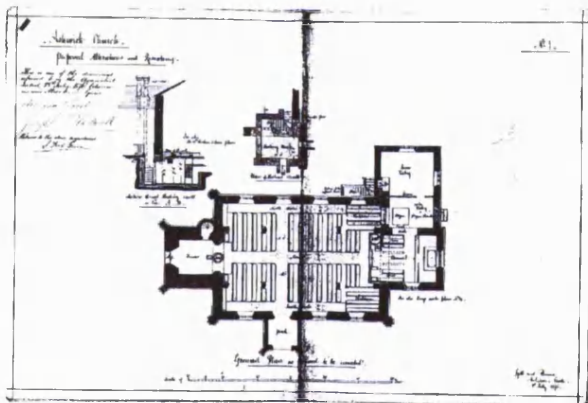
St. James's Church, Ashwick. Floor plan with details of heating vault. Signed Gill & Browne, 1 July 1876. Thomas Browne's drawing.
